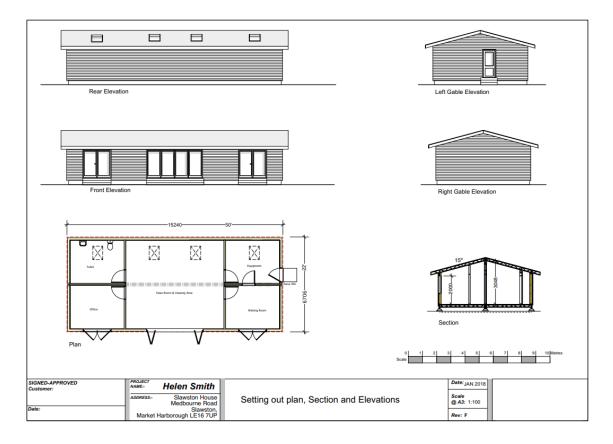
Plan & elevations of proposed classroom. Plan provided by client.
